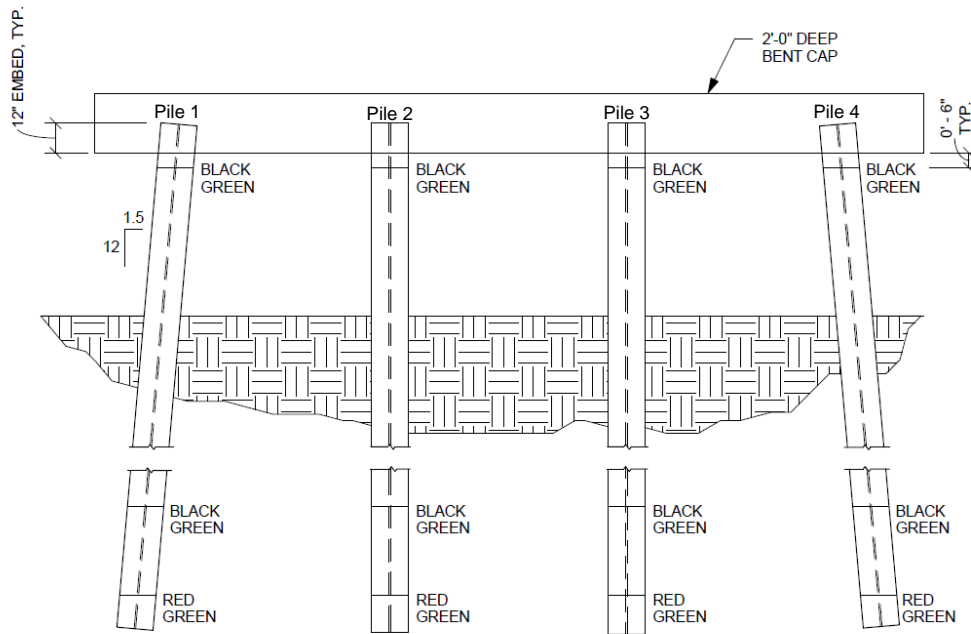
Steel Pile Instrumentation Layout Facing Away from Old Town Creek
